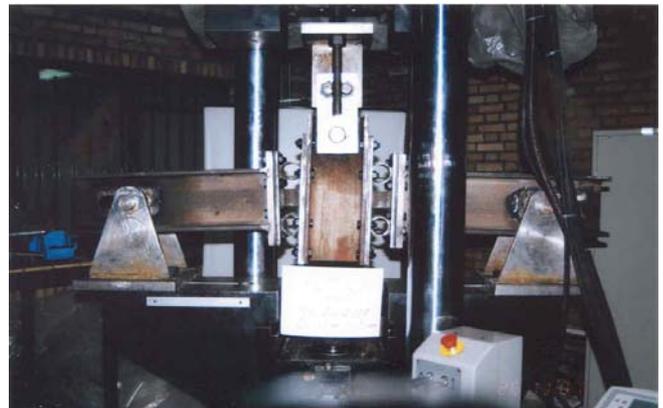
Third test assembly, with HLT-C3 specimens, at its utmost upper position, before failure.
